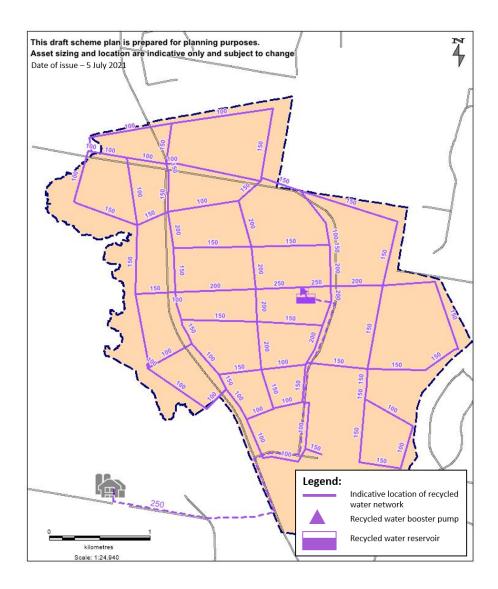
DRAFT Mamre Road recycled water scheme plan
